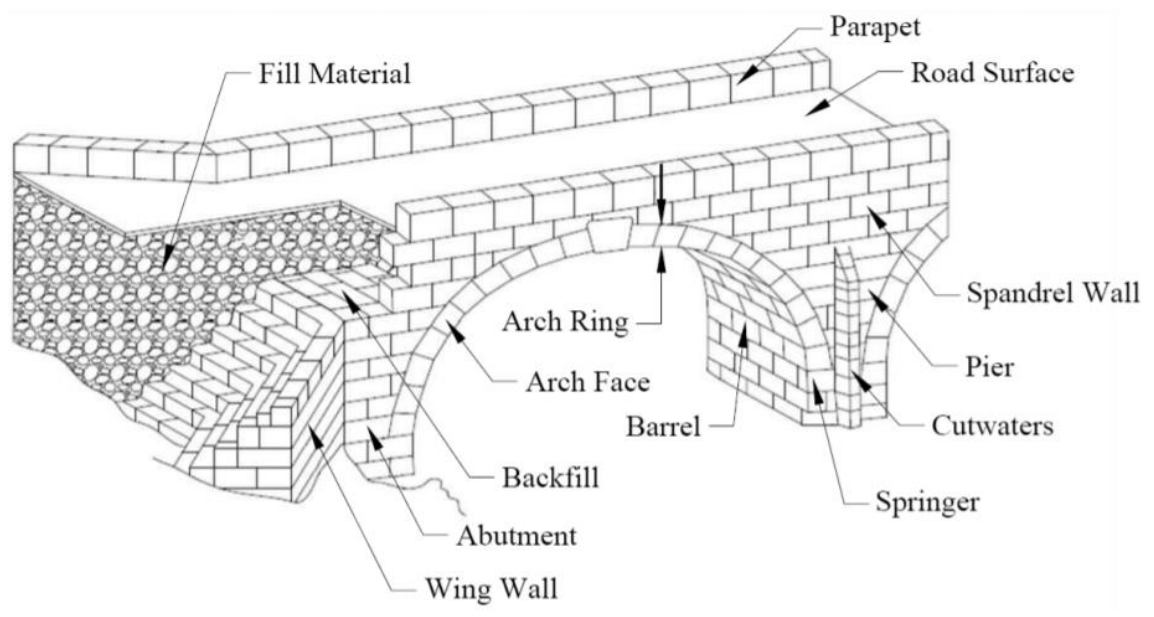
Typical terminology for masonry arch bridges (Siwowski, 2015)
